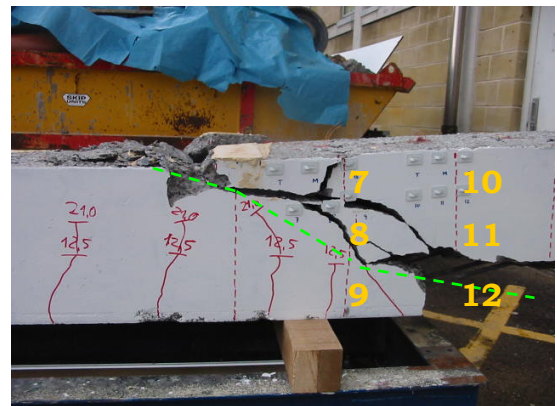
Right span of SLB P4d-C7.5@d at failure
